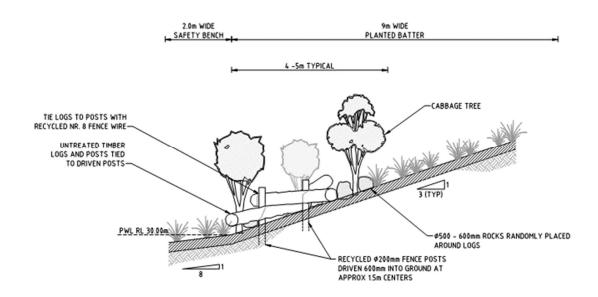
Glaisdale planted stormwater wetland, Hamilton City
